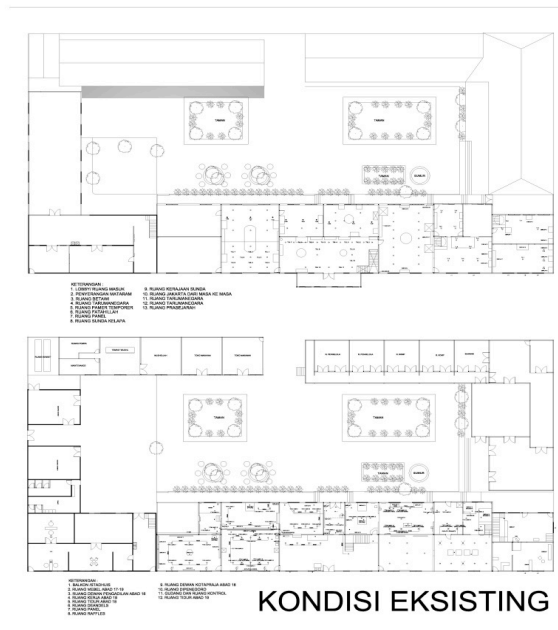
The layout of existing plan of Fatahillah Museum (first floor and second floor)
